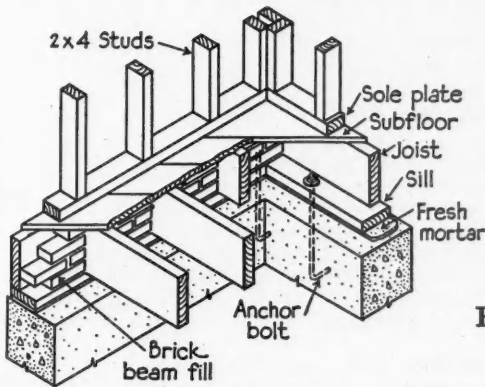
BOX SILL ASSEMBLY WITH SILL PLATE
